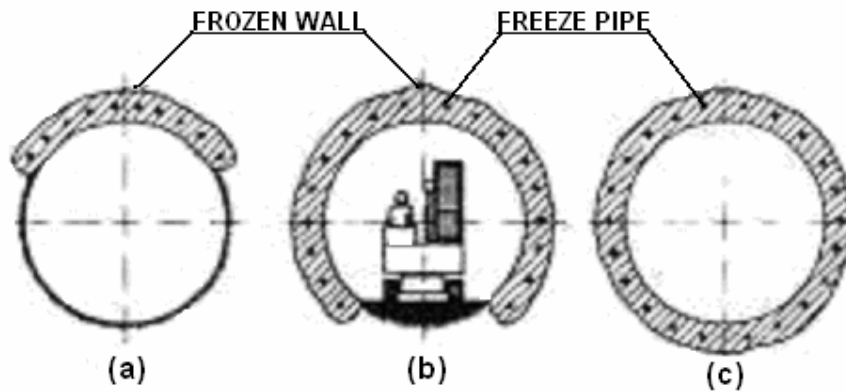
Design possibilities of the frozen walls around the tunnels: (a) roof, (b) roof and sides, (c) closed ring (Andersland, 2004)
